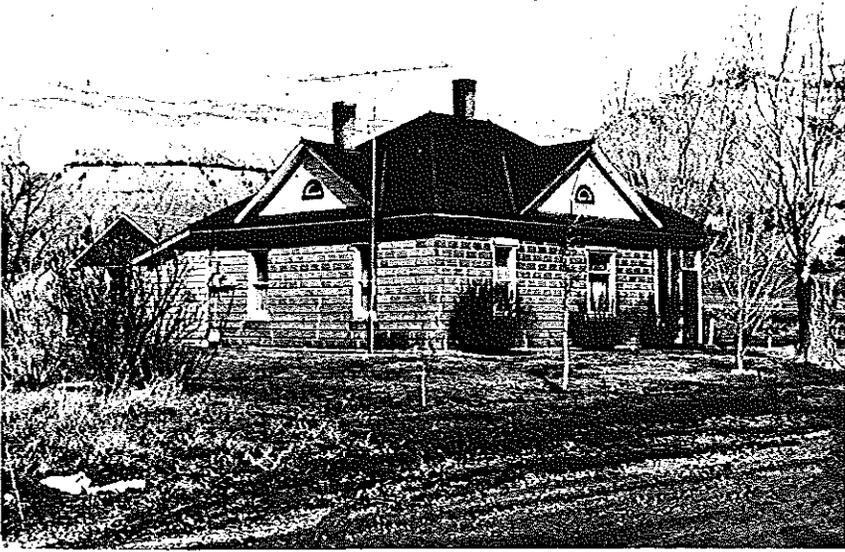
A RESIDENTIAL STRUCTURE CONSTRUCTED OF CONCRETE BLOCK. NOTE PATCHED CRACKS AND CHIMNEYS.
